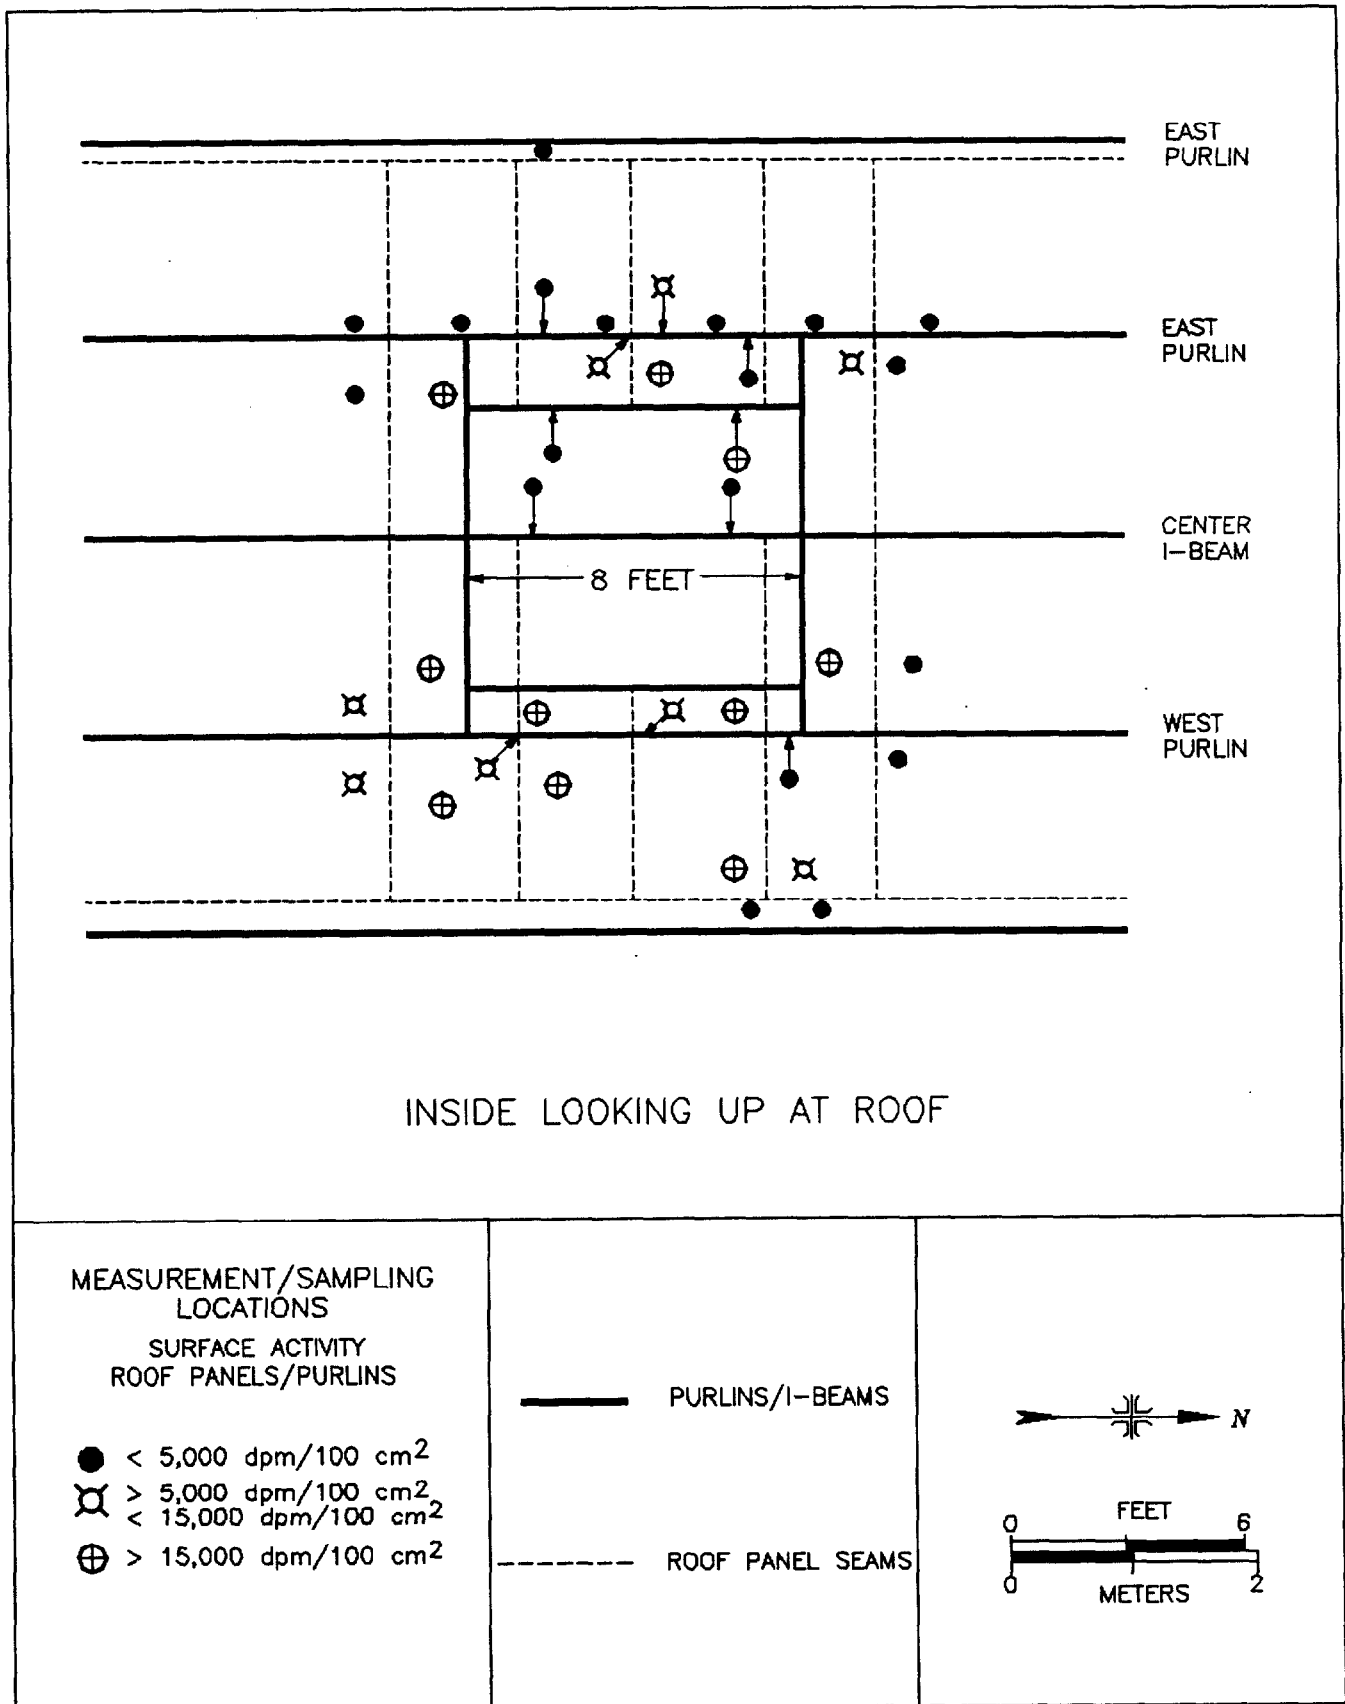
Building 3, North Turret Penetration – Measurement and Sampling Locations
